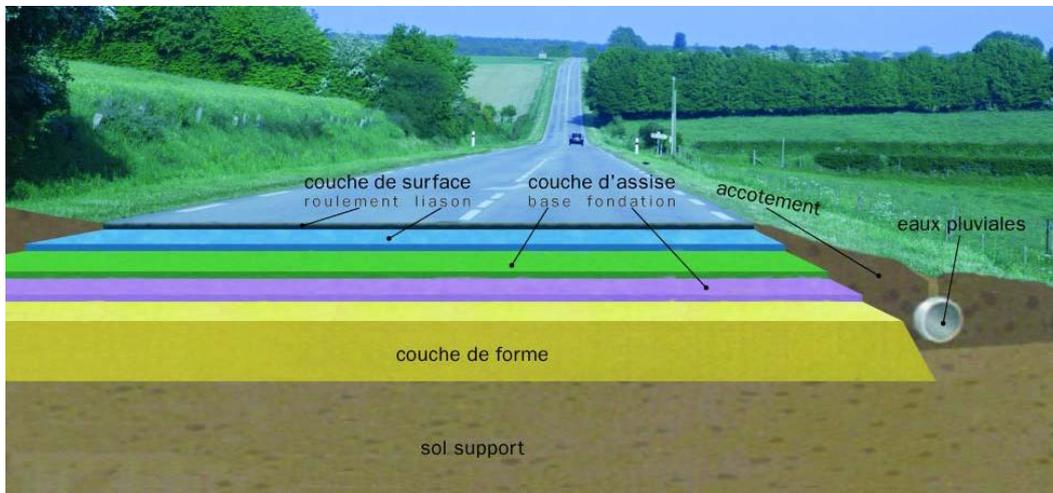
Permanent road structures on which contaminated excavated soil can be reused
